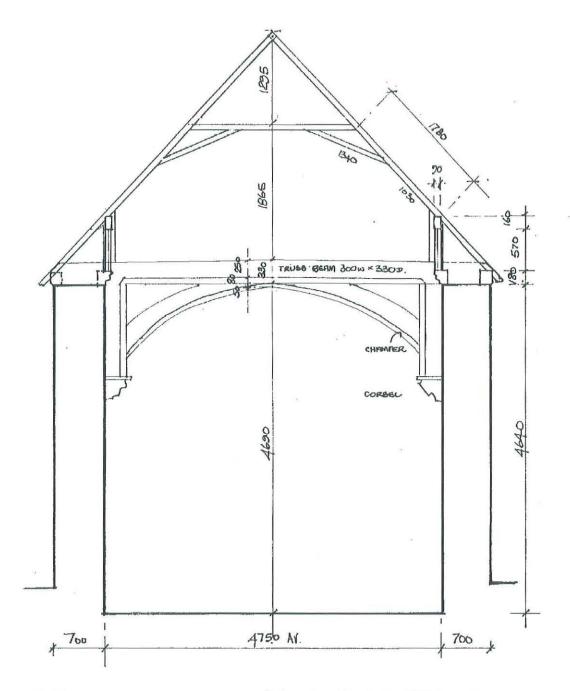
Cross-section of the nave roof showing the form of the central truss, adapted from an original drawing by Kay Pilsbury
